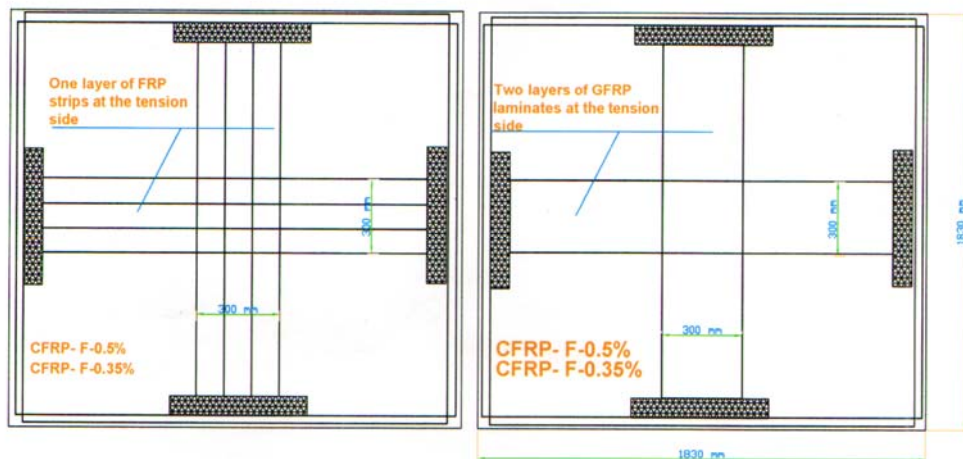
Layout of the flexural –strengthening scheme ^[28]
